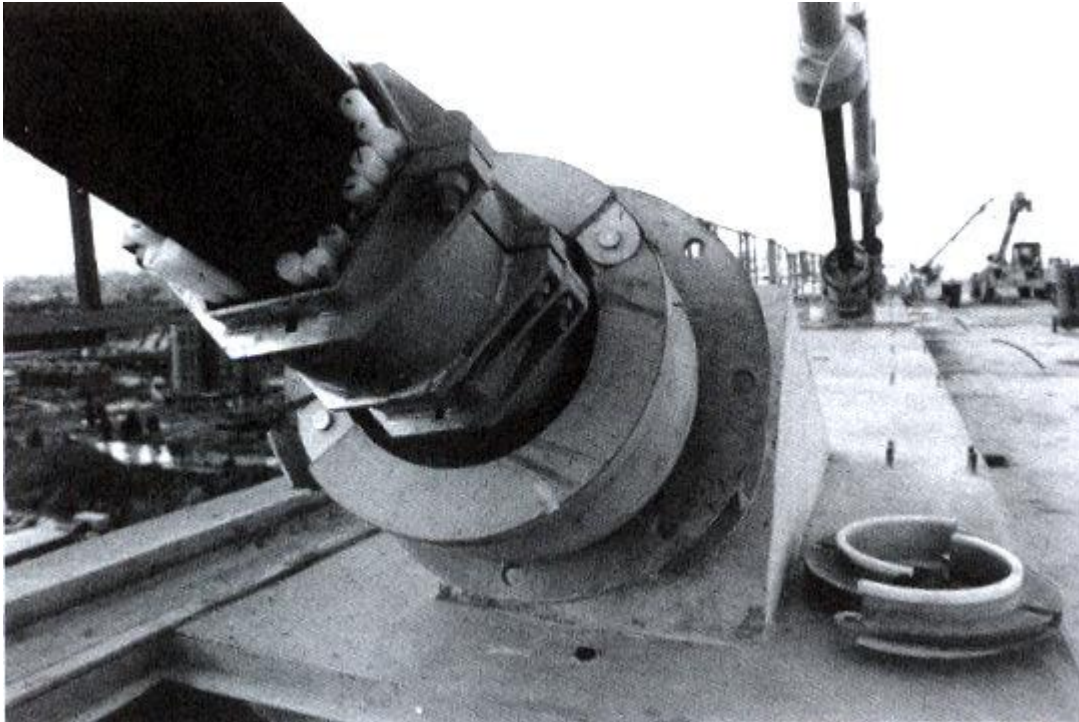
Internal damper installed on a stay cable of Vasco da Gama Bridge.
